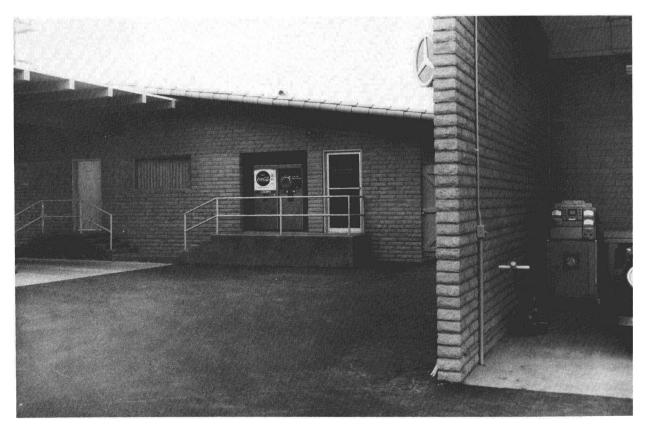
Auto dealership structure made using solid concrete block. A one-wythe wall is shown on the garage side. (Masonry Institute of America)
